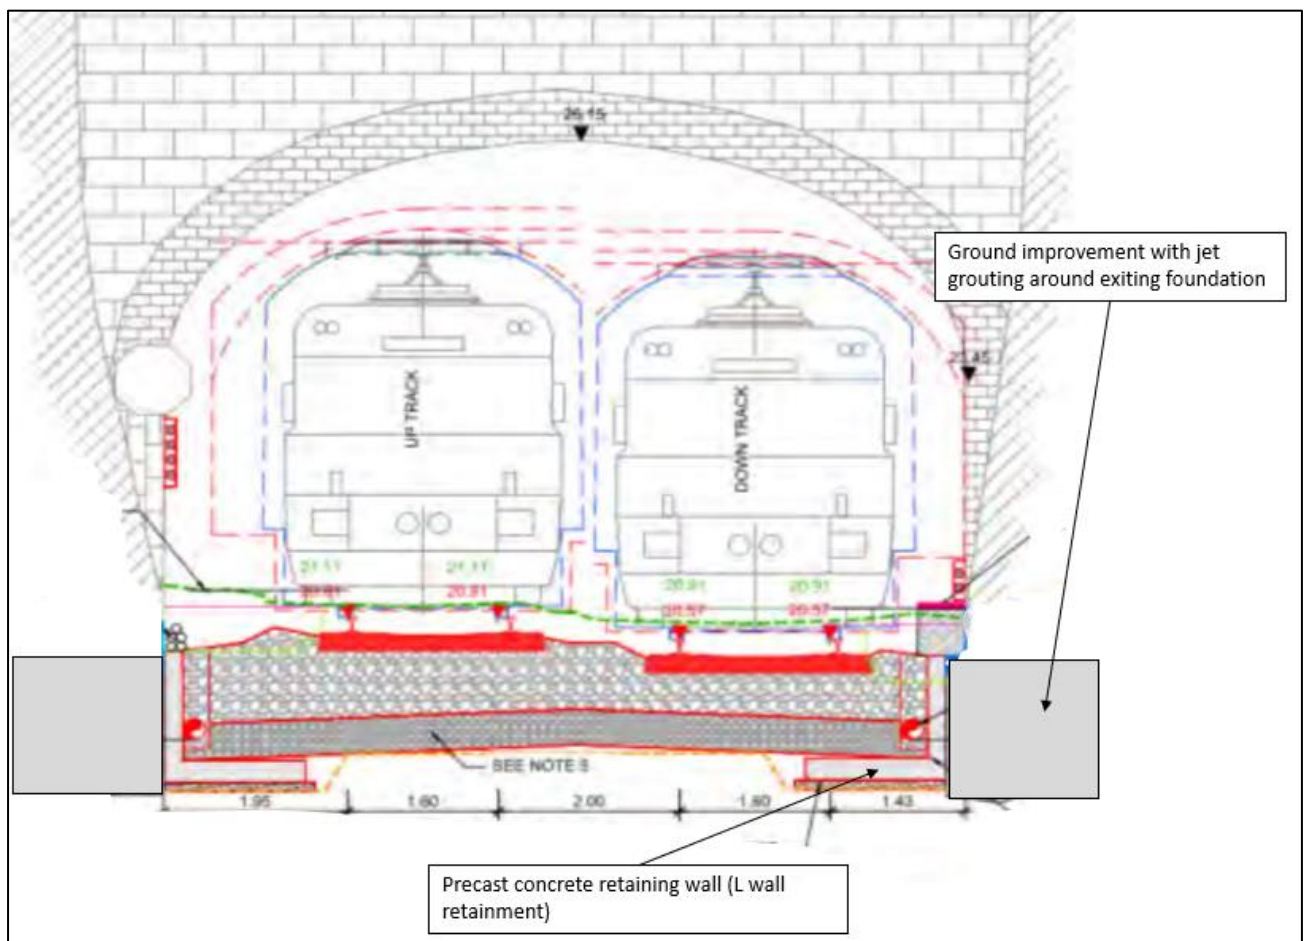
Section at OBD 222 Showing Proposed L-Form Retaining Wall and Ground Improvement
